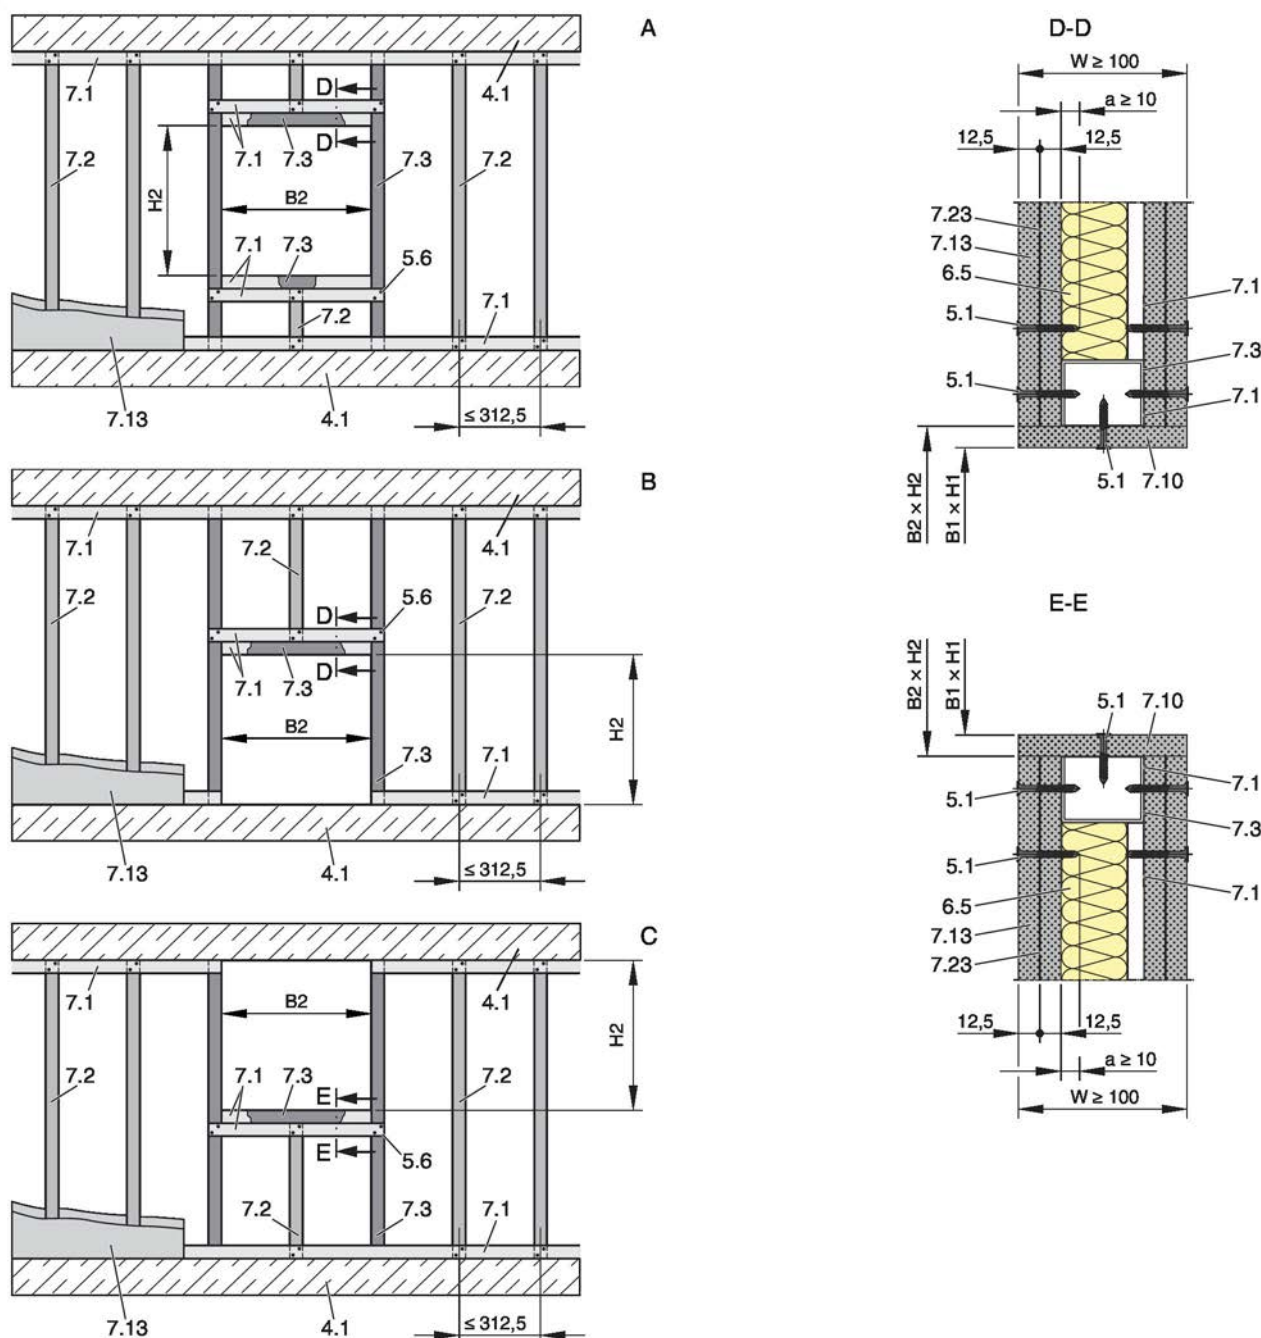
Compartment wall with metal support structure and cladding on both sides
